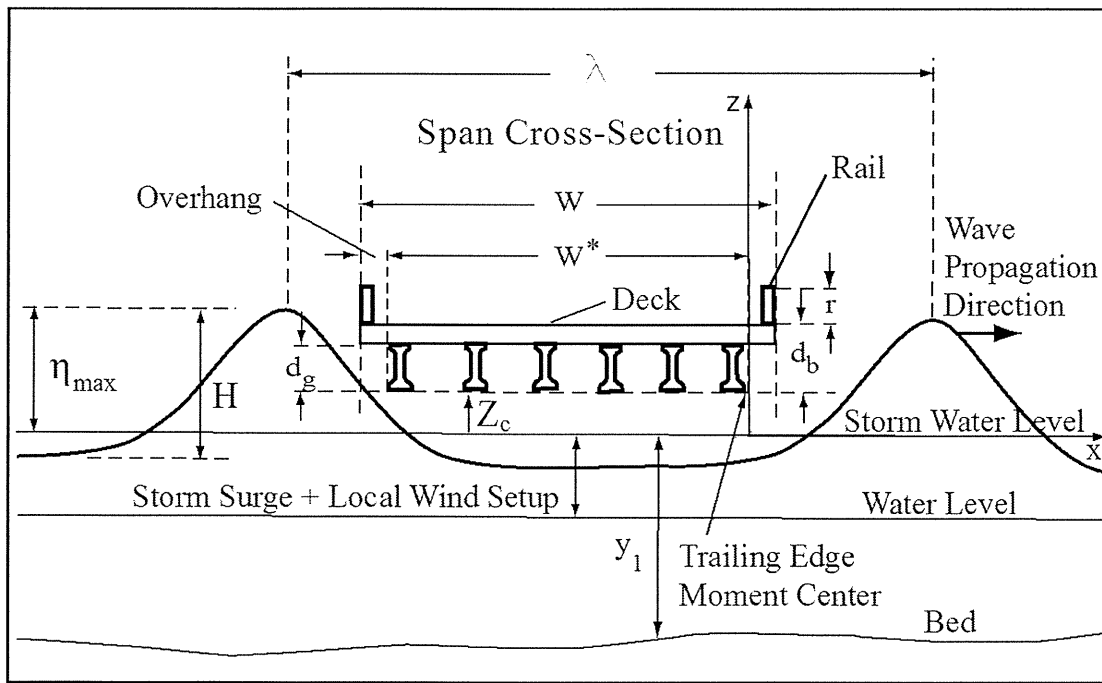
Figure (Notation) 1 Definition sketch for storm surge and wave loading on bridge superstructures.
